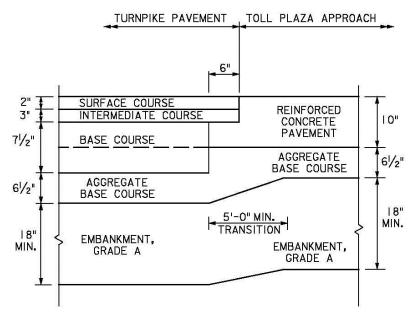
18: TURNPIKE TOLL PLAZA PAVEMENT INTERFACE
